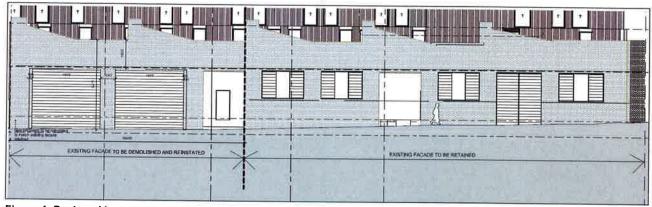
Designed louver screens with the section of wall to be demolished and reinstated in context of the existing façade.
